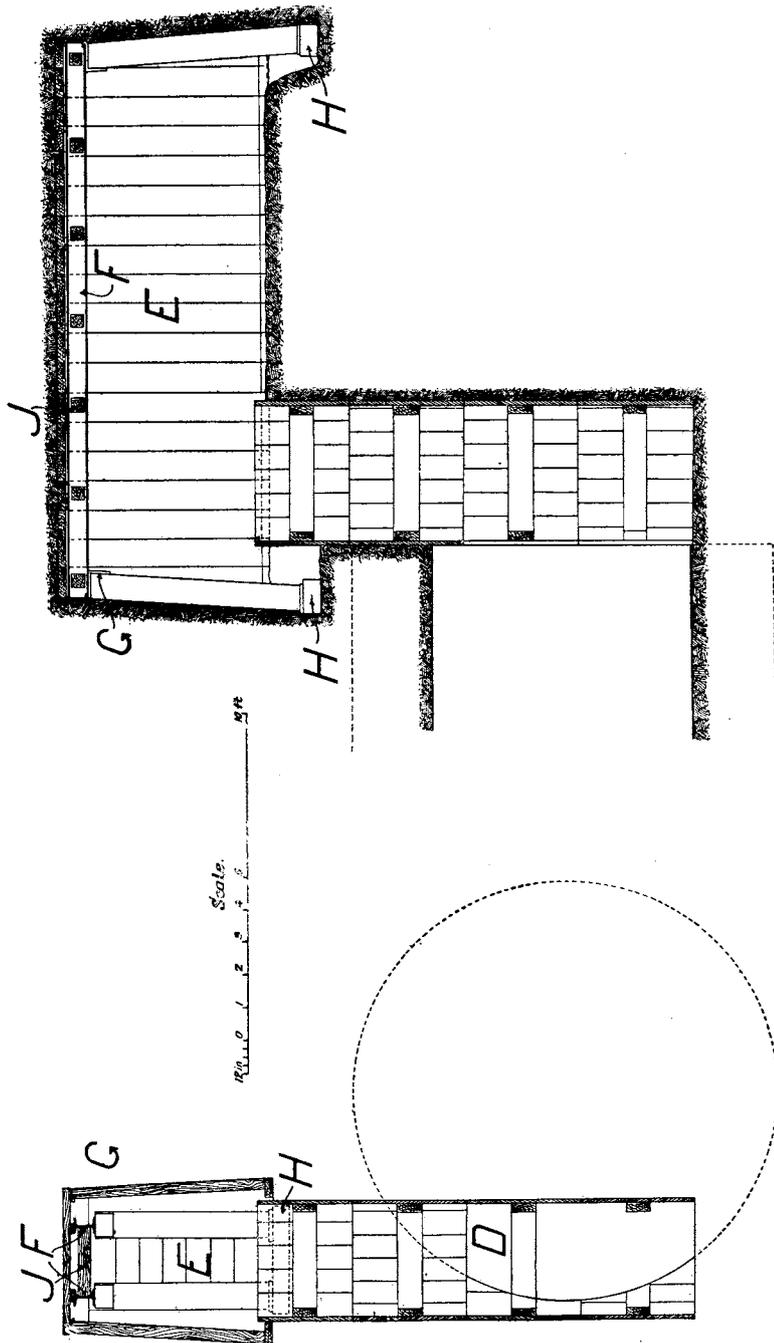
BAKER STREET AND WATERLOO RAILWAY, LONDON.
